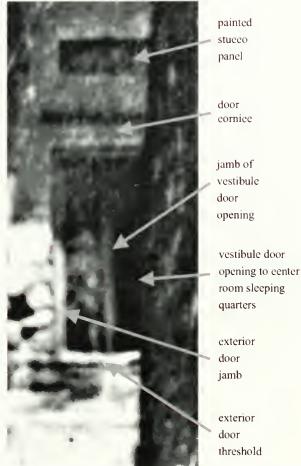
South elevation, center door. This further enlargement of the 1864 Andrew Russell photo shows the west side of the inner vestibule wall visible through the center room exterior doorway.
